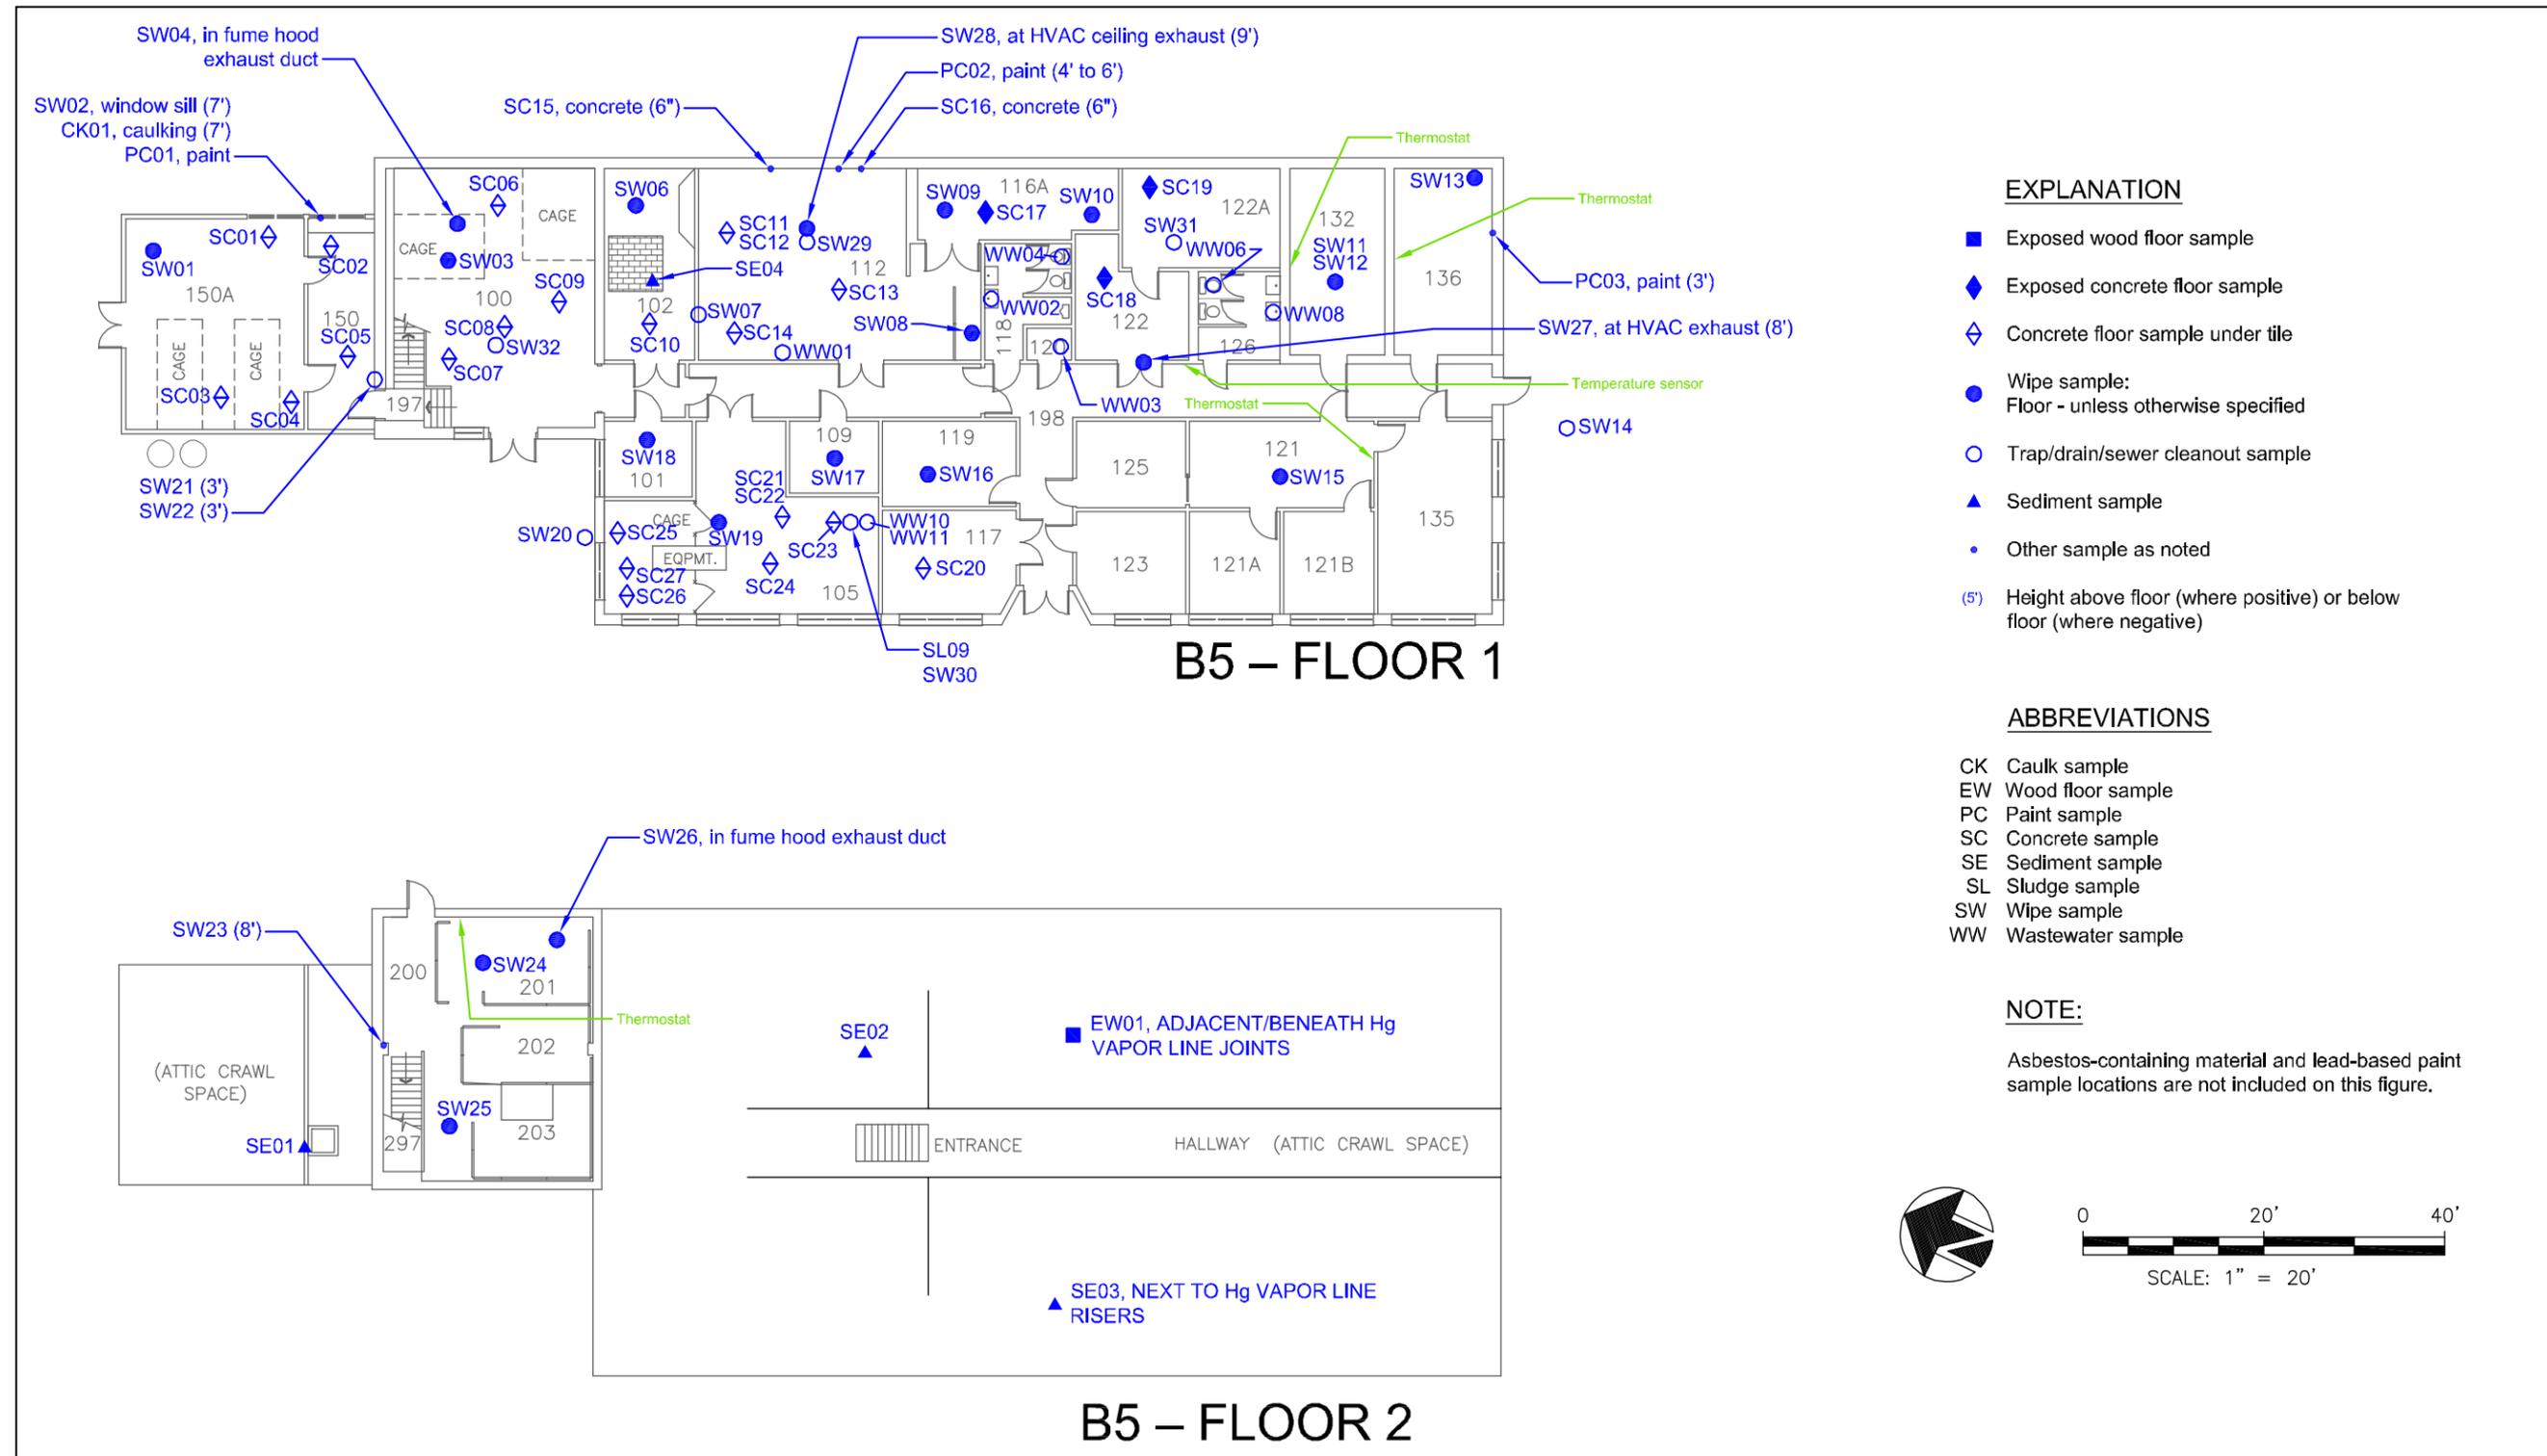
Non-Radiological Sampling Locations – Building 5
